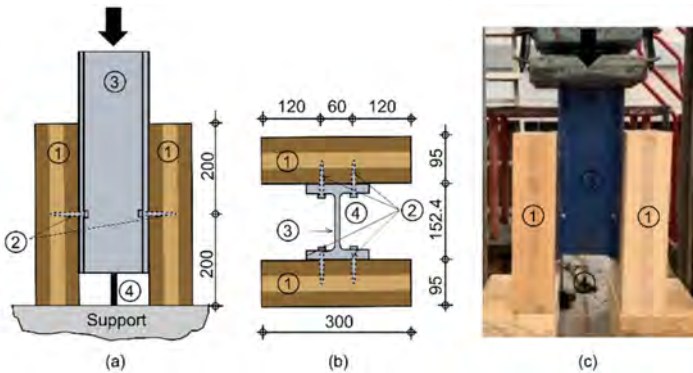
Details of the test specimens: a) schematic front view, b) top view, c) view of a test specimen (legend: (1) CLT panel, (2) screws, (3) steel profile, (4) transducer, arrow indicates reaction point).
